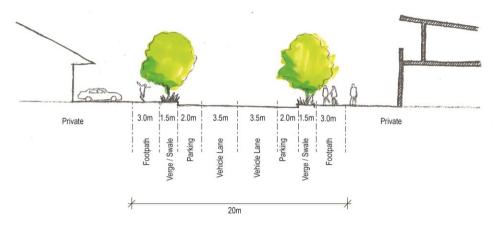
Growth Areas - typical road cross sections: Collector Roads
